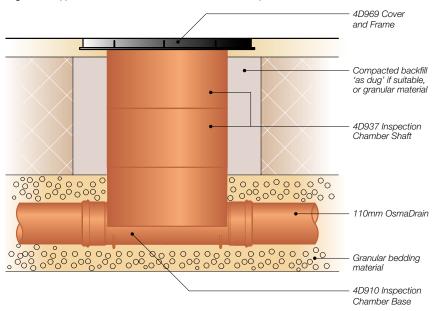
Typical installation detail: Multi-Base Inspection Chamber
